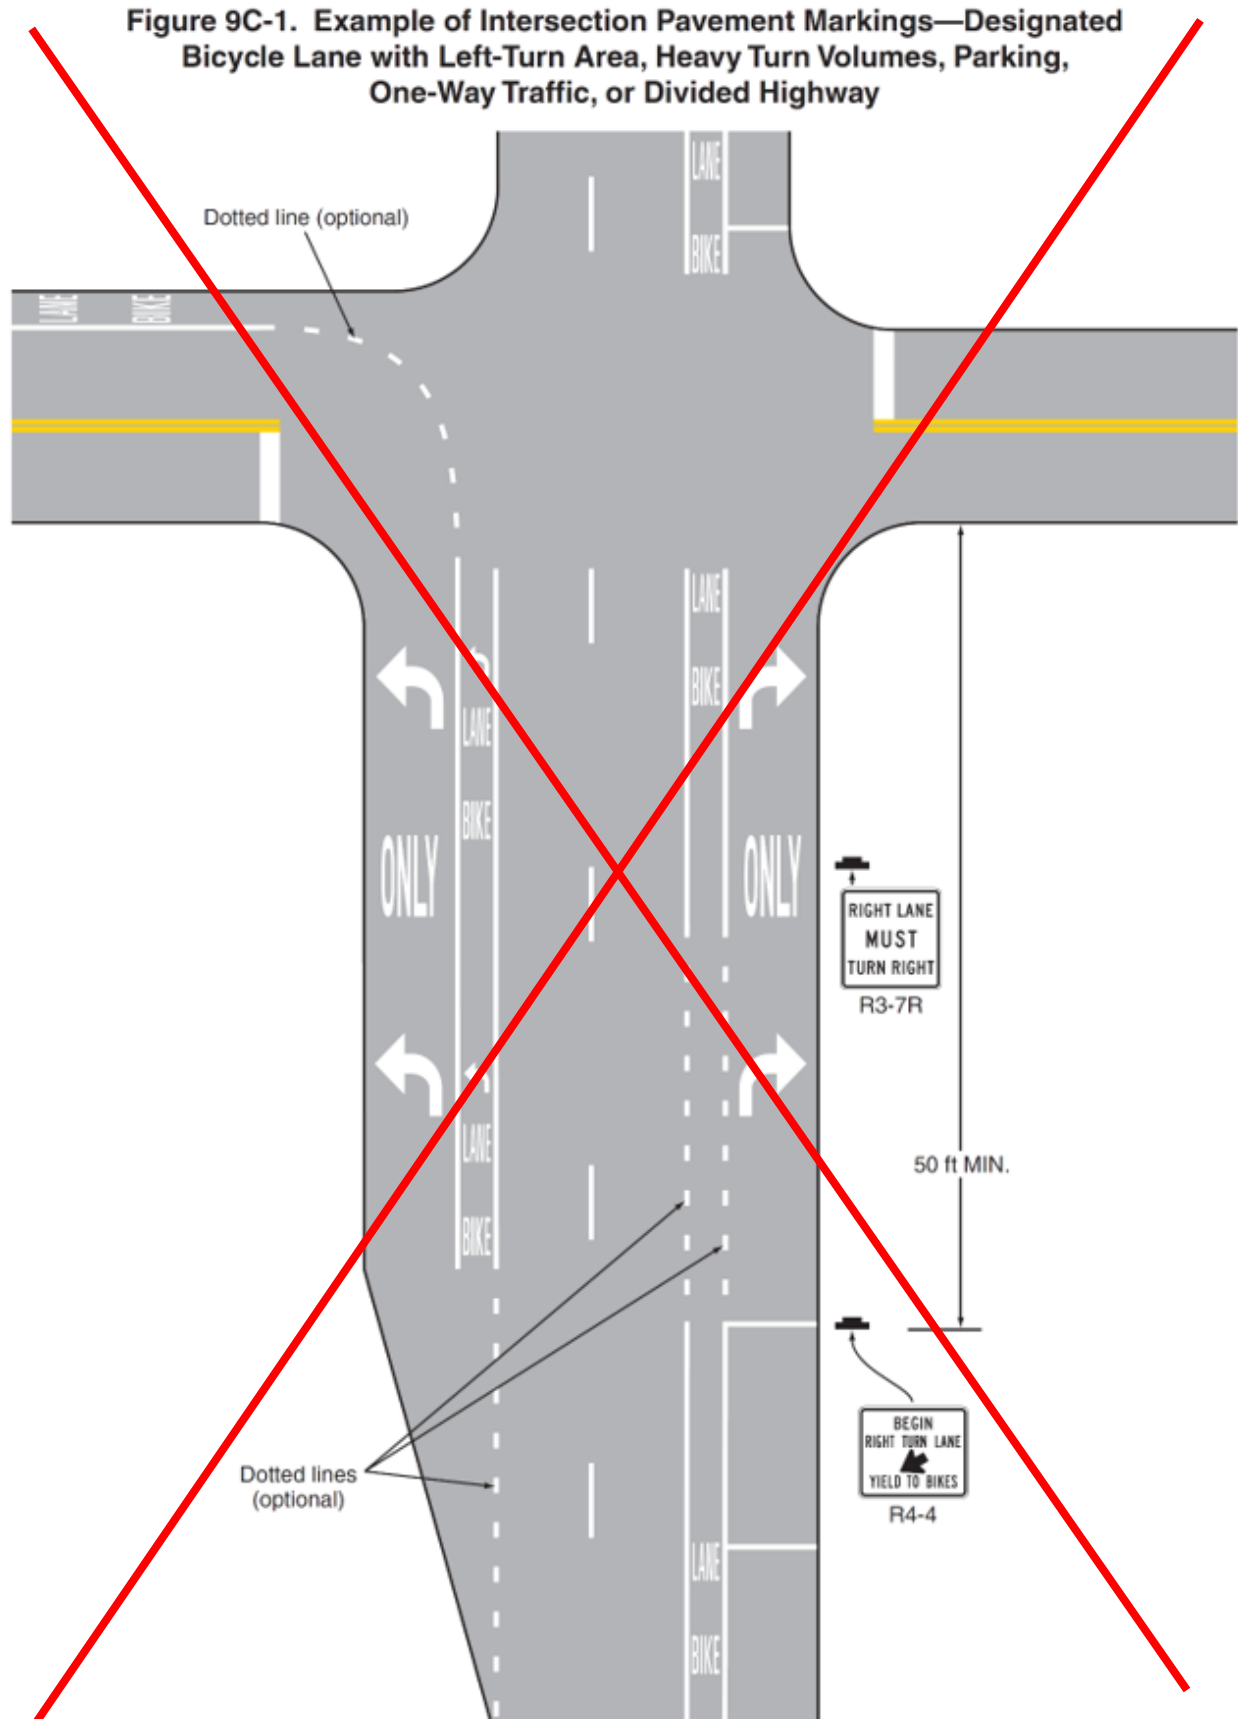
C-1. Example of Intersection Pavement Markings—Designated Bicycle Lane with Left-Turn Area, Heavy Turn Volumes, Parking, One-Way Traffic, or Divided Highway
